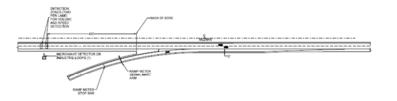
Single Lane Ramp Meter with Transit Bypass Detection
